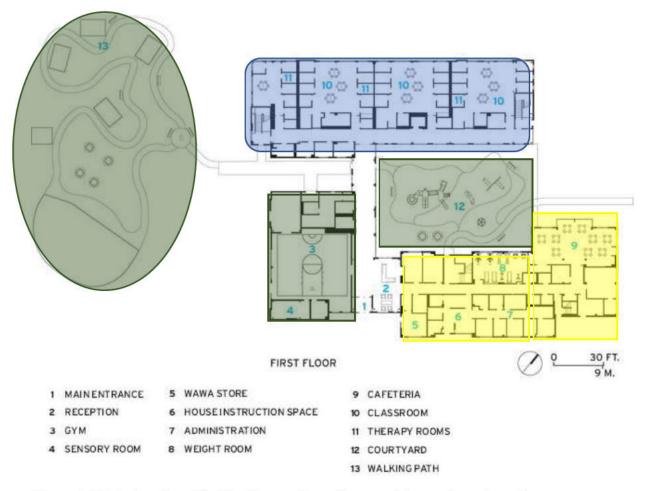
Zoning plan of facility (Source: https://www.architecturalrecord.com/)
